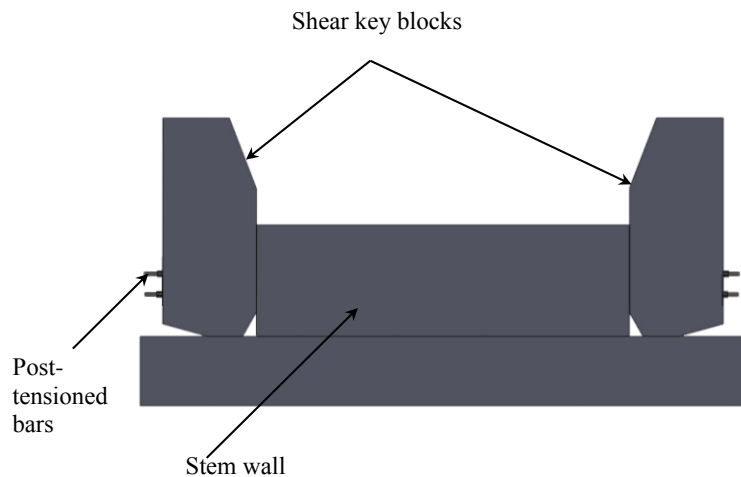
Main parts of Specimen 11 with pre-stressed shear keys
